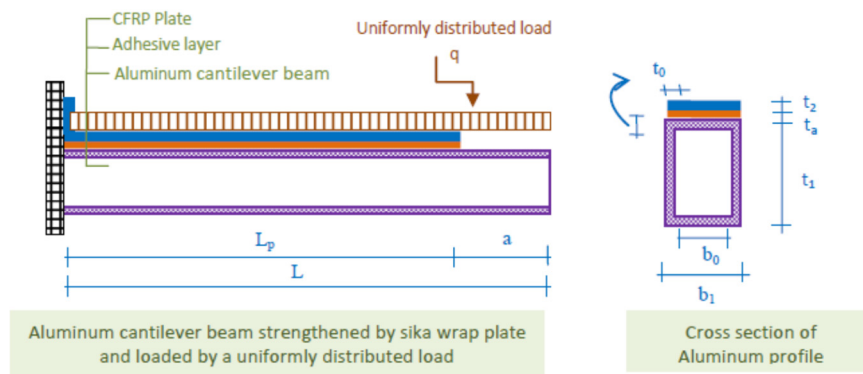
Structure configuration of a aluminum cantilever beam strengthened by Sika wrap plate
